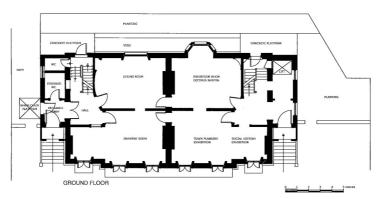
The Decimus Burton Museum - proposed ground floor plan. Copyright Paul Avis
